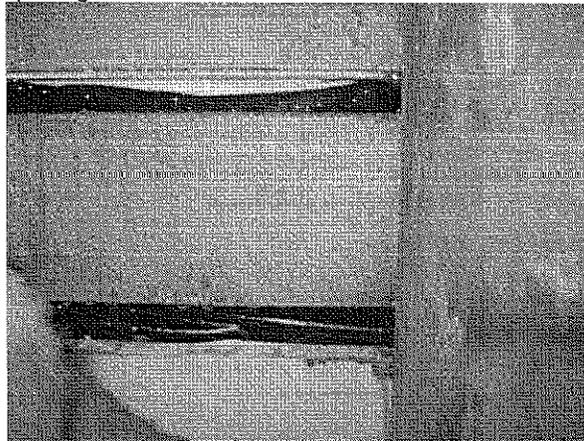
Condensation on the backside of a brick lintel – the thermal bridge exasperating the in wall problem
